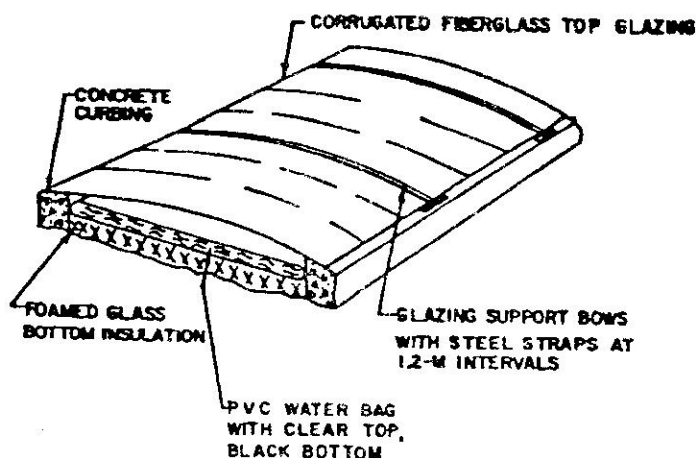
Cross-Sectional View of Shallow Solar Pond Module.
